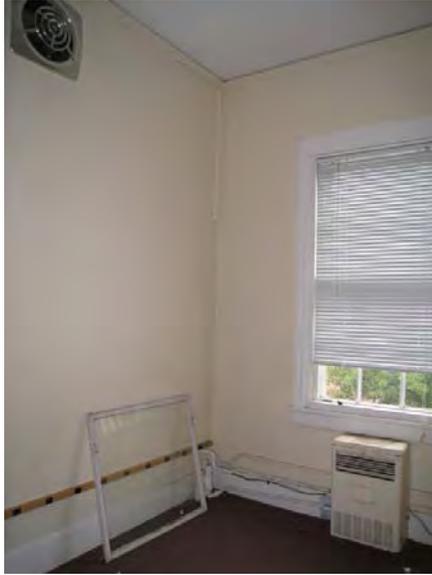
Outlet strip, wiremold, wires and conduit mounted to walls in Room 203.
